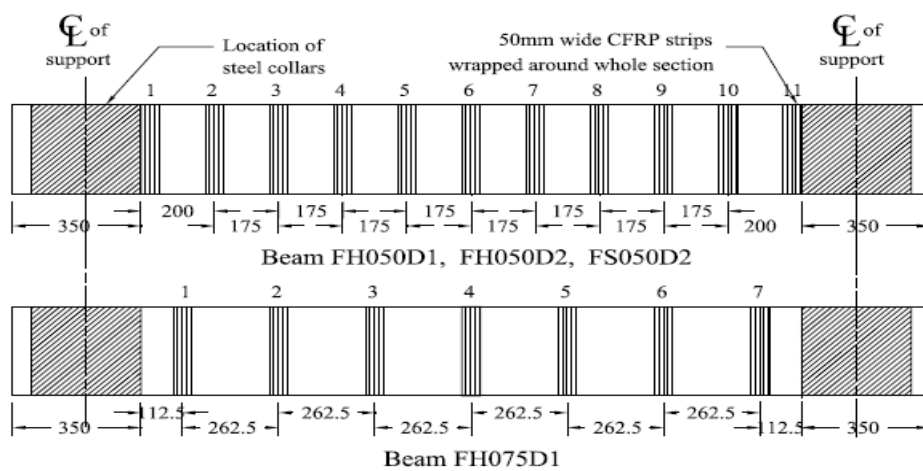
CFRP layout of strengthened specimens [Hii and Al-Mahaidi 2006]
